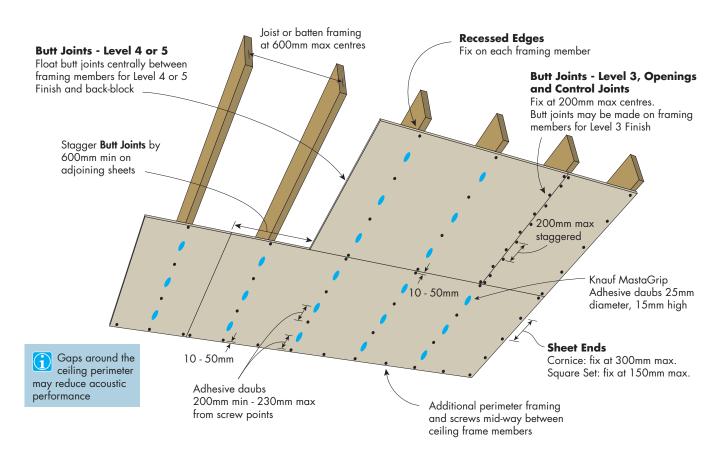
Plasterboard Ceiling Perimeter Detail
